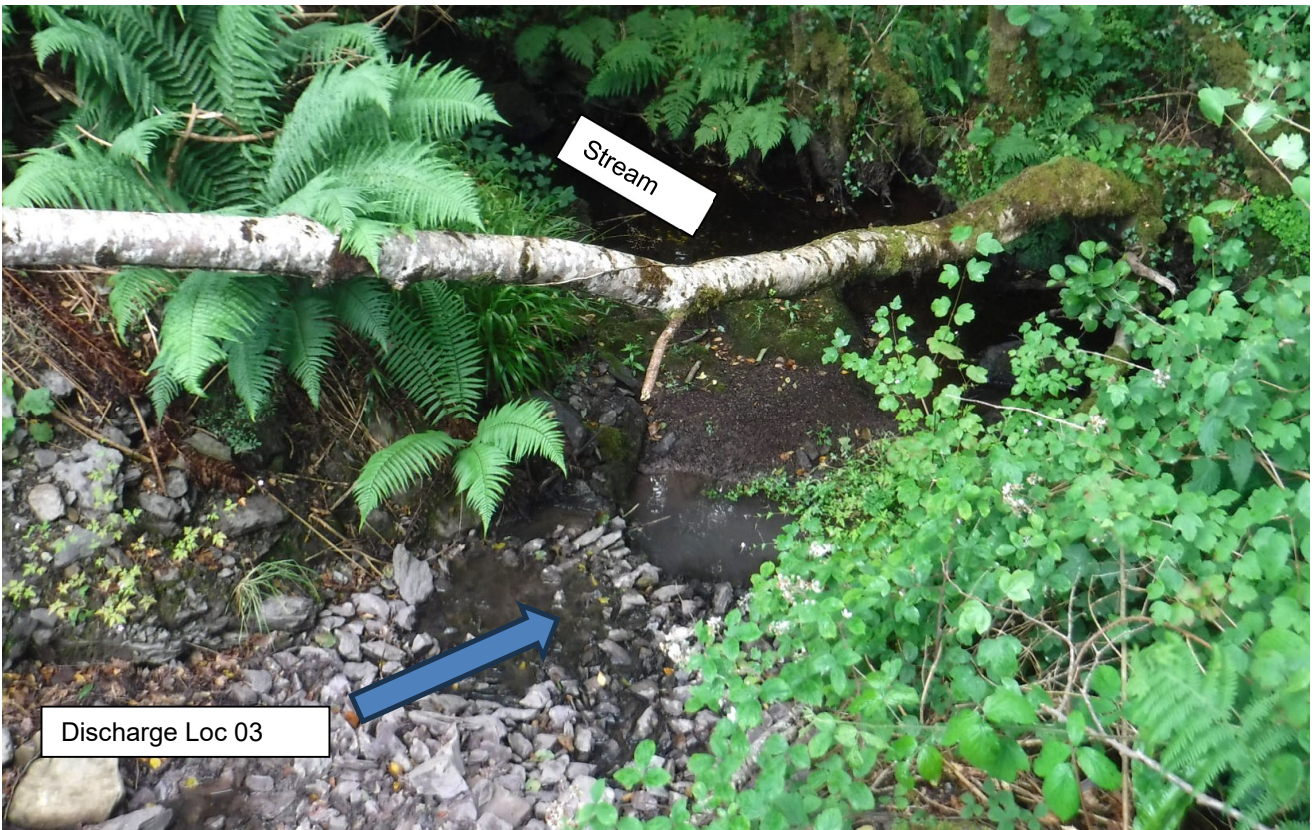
View of SW discharge location 03 for Tarmac Plant stormwater runoff to stream.
